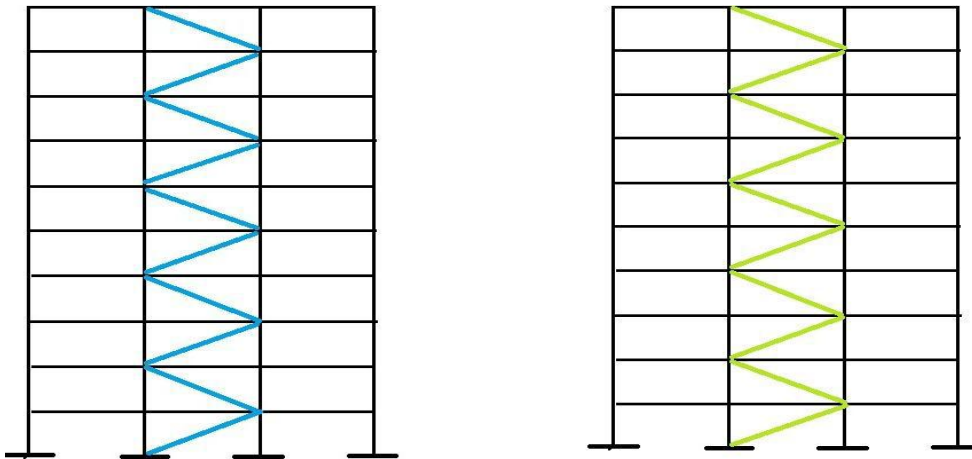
Front elevation of frame without brace dampers .Fig3b.Front elevation of frame with friction damper braces.
